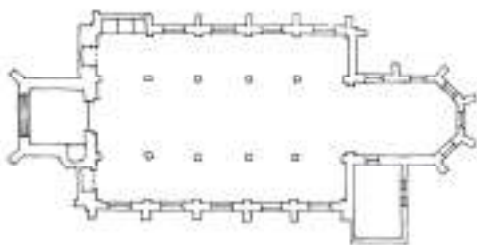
The original floor plan of the Jacobuskerk with the old choir.
